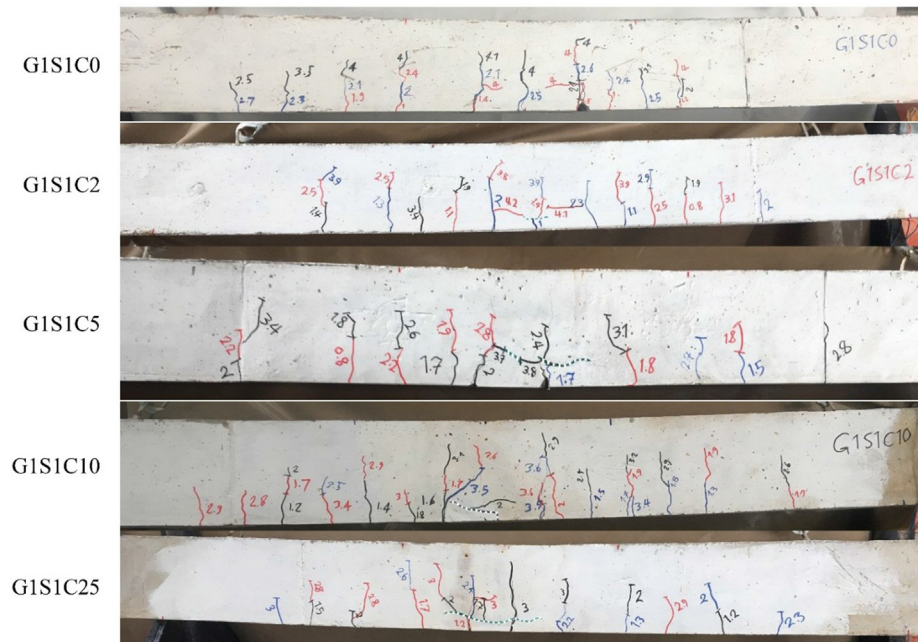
The cracking pattern of specimens 1 stirrup.
